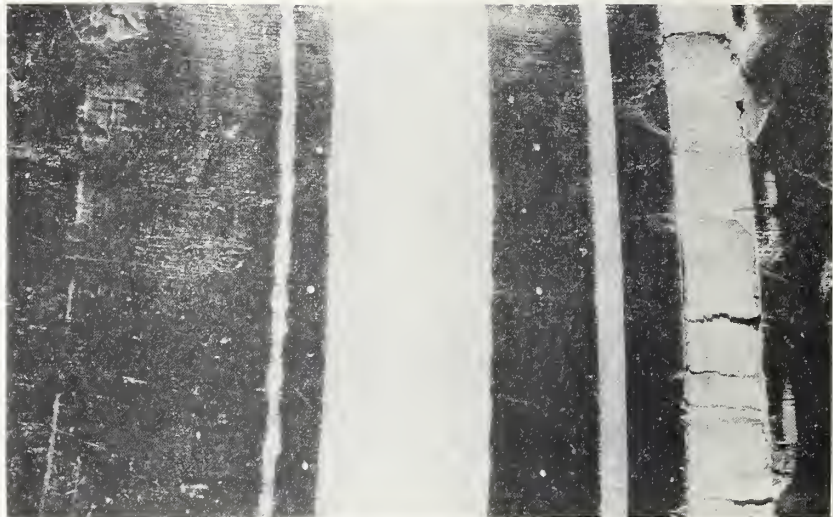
Asphalt and pitch mastic felt base on wood subfloor (test panel 10L).
